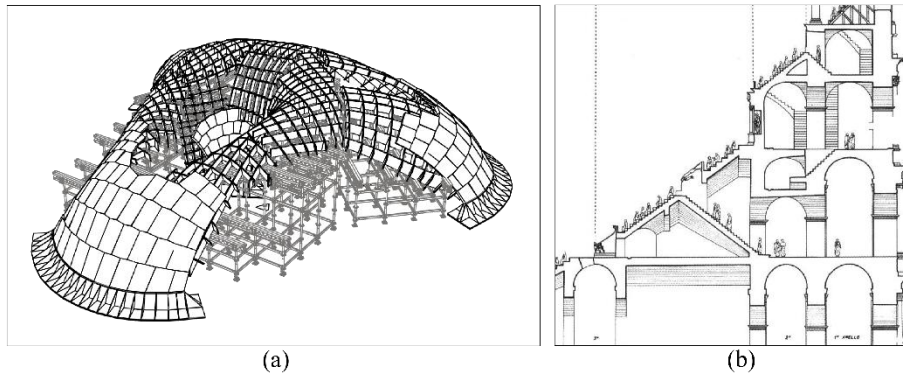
(a) Custom-made falseworks for constructing Armadilo Vault [10]
